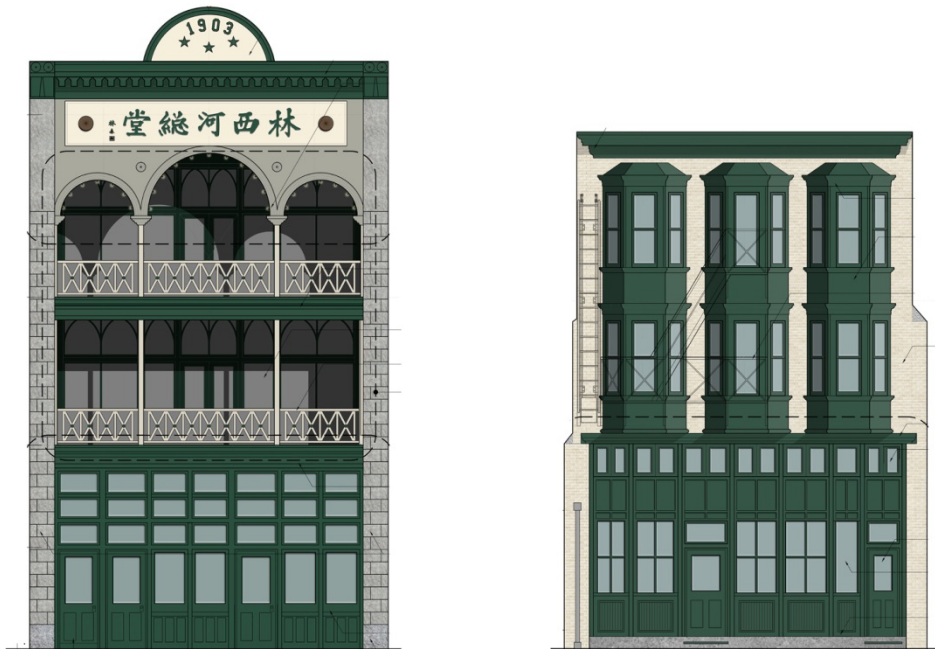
Lim Sai Hor Association Building - Carrall Street and Shanghai Alley facades after rehabilitation
